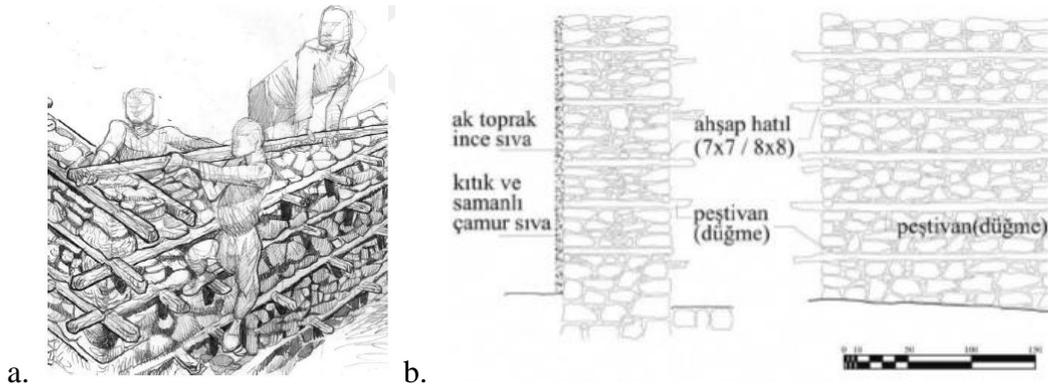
Drywall building technique (Kavas, 2011); 16b. Traditional Wall Lining (Tayla, 2007)
